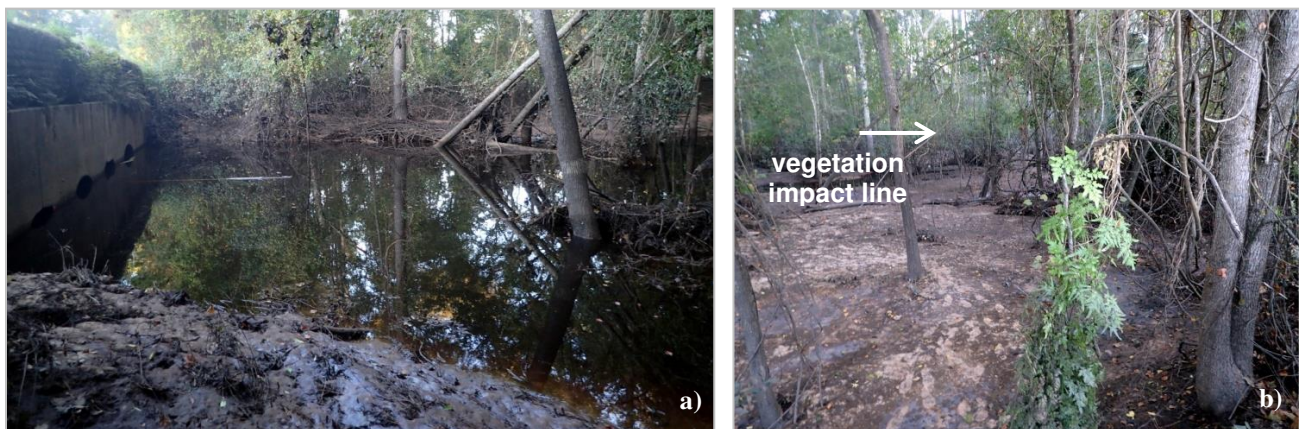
Downstream view of the road crossing at Pigeon Creek near 30°46'45.19"N latitude and 81°58'24.6"W longitude after the failure, illustrating: (a) the dam outlet under Hampton Road with four small diameter openings in a concrete culvert, stacked concrete sack wall stabilizing the roadway, and evidence of high water levels; and, (b) evidence of high water levels, sediment buildup, and debris within the floodplain.
